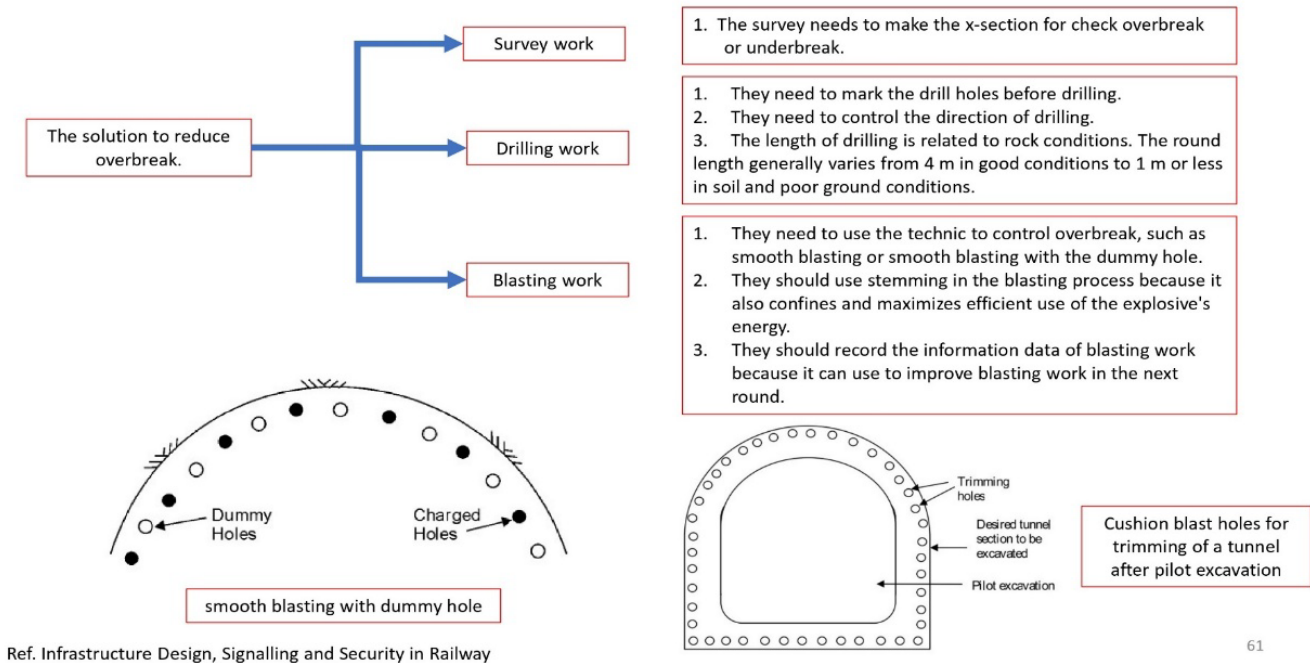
Proposed control workflow to reduce overbreak for tunnel construction
